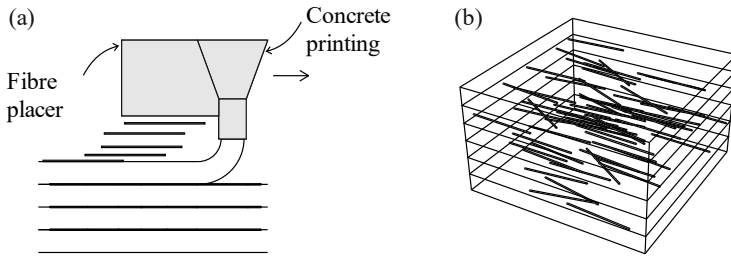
Schematic sketch of the reinforcement concept for interlayer fibre reinforcement: (a) concrete layers printed by a nozzle with the continuous placement of fibres; (b) resultant layered concrete with aligned fibres in-between the layers [3].
